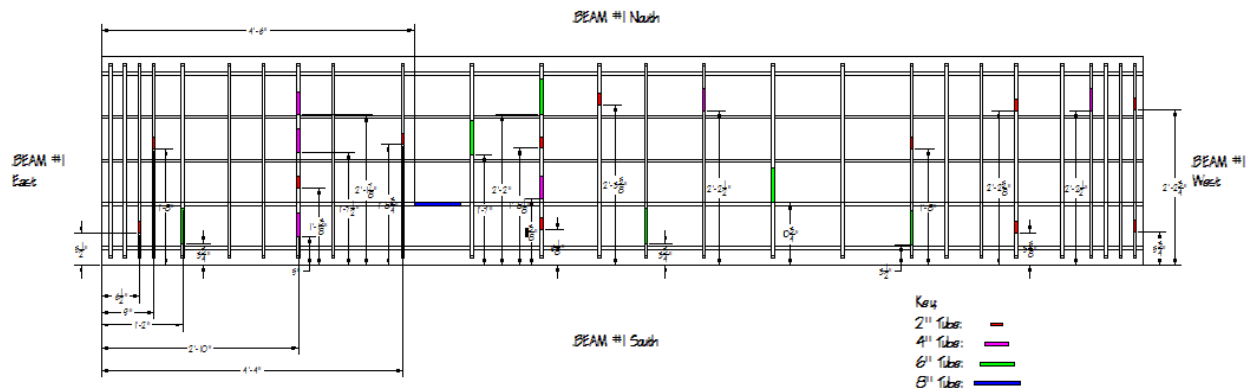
Top plan of box beam showing locations and defect length around Top reinforcement
